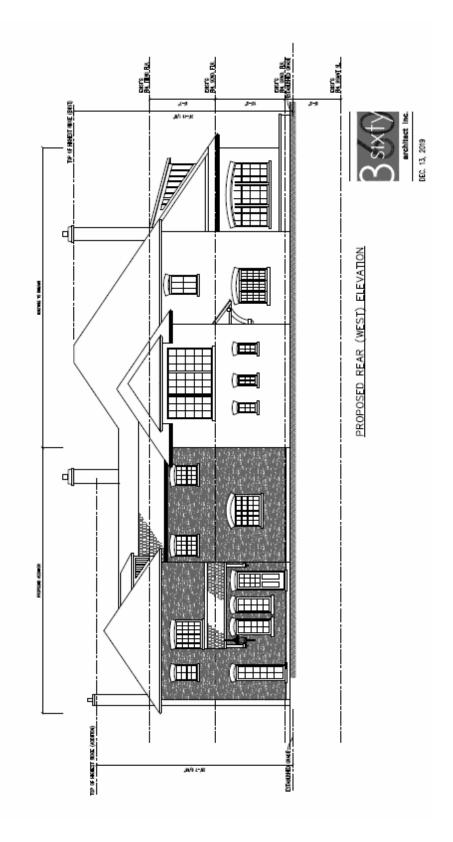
The rear or west elevation of 1341 Stavebank Road with proposed addition. (Image from owners.)
